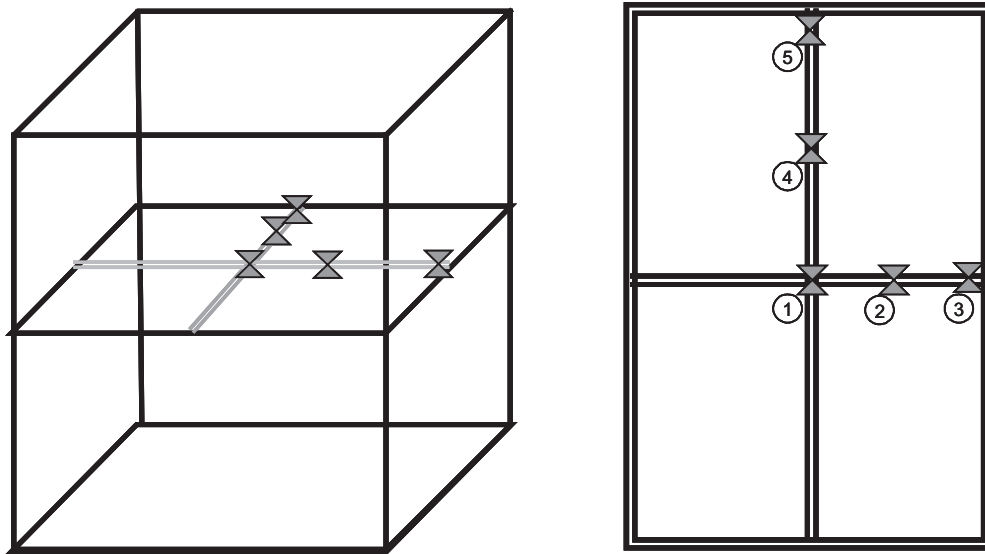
Arrangement of thermocouples in concrete section and numbering
